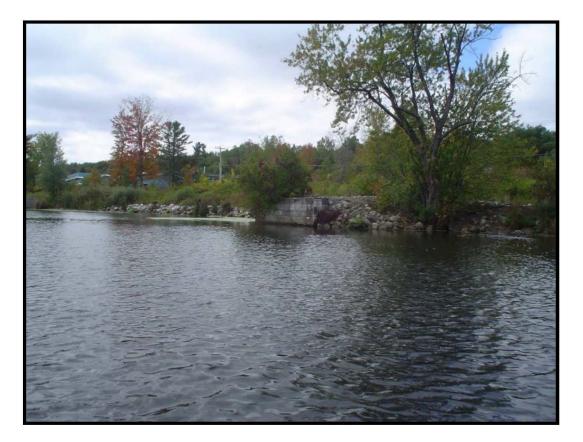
Dam/Bridge Remnants Just North of Current Woods Pond Dam, View West.
